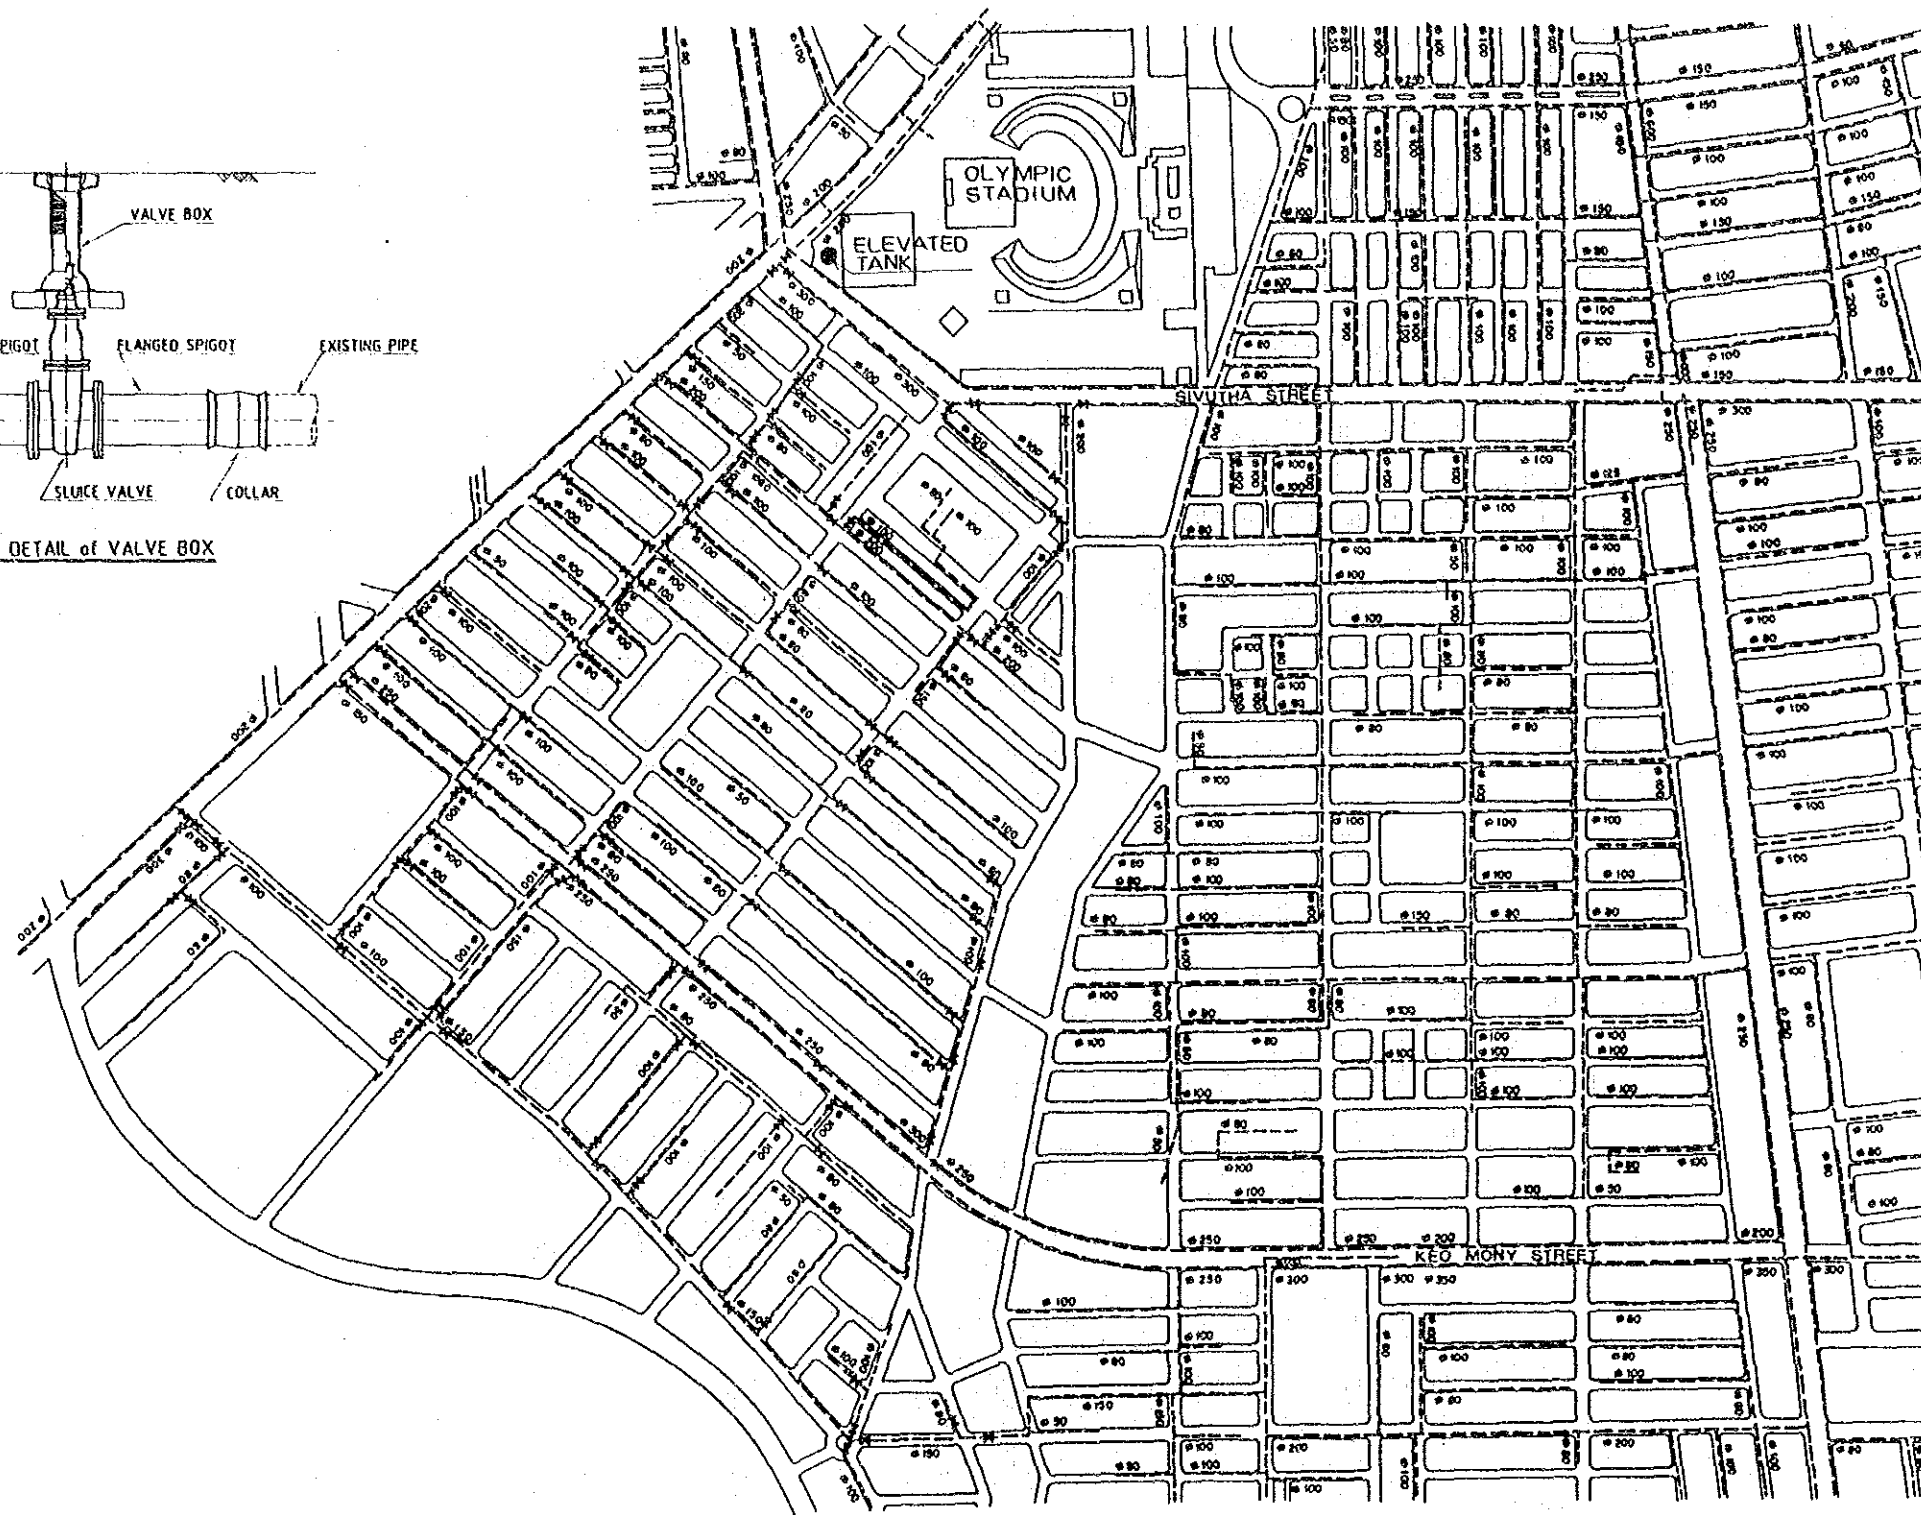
INSTALLATION DRAWING OF SLUICE VALVES
